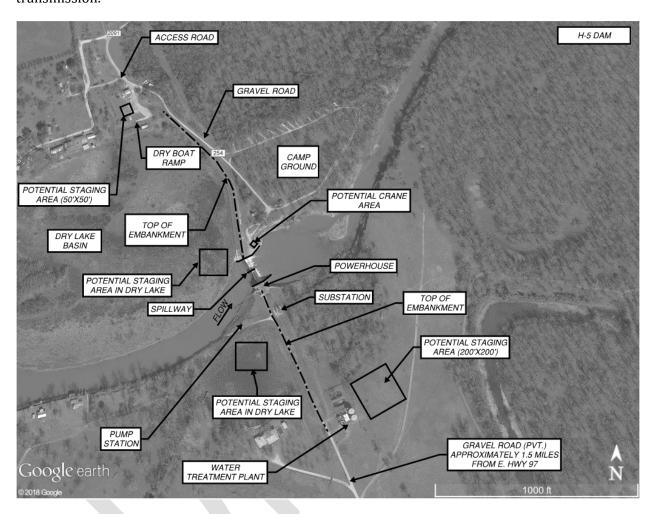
H-5 (Lake Wood) Spillway Site Plan
